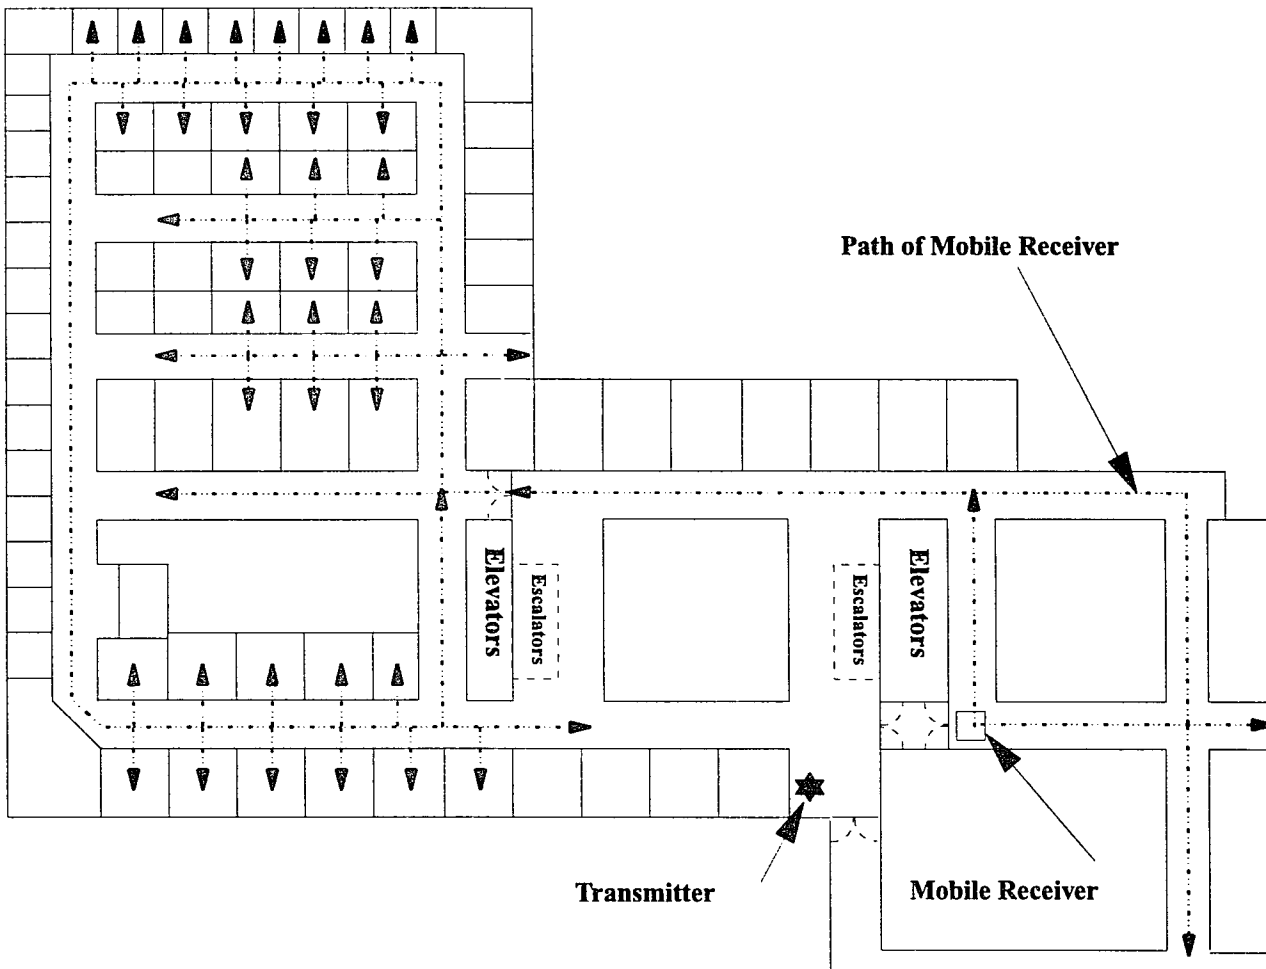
Floor plan of the 6th floor of NAC Building (site B), showing the transmitter and receiver locations.
